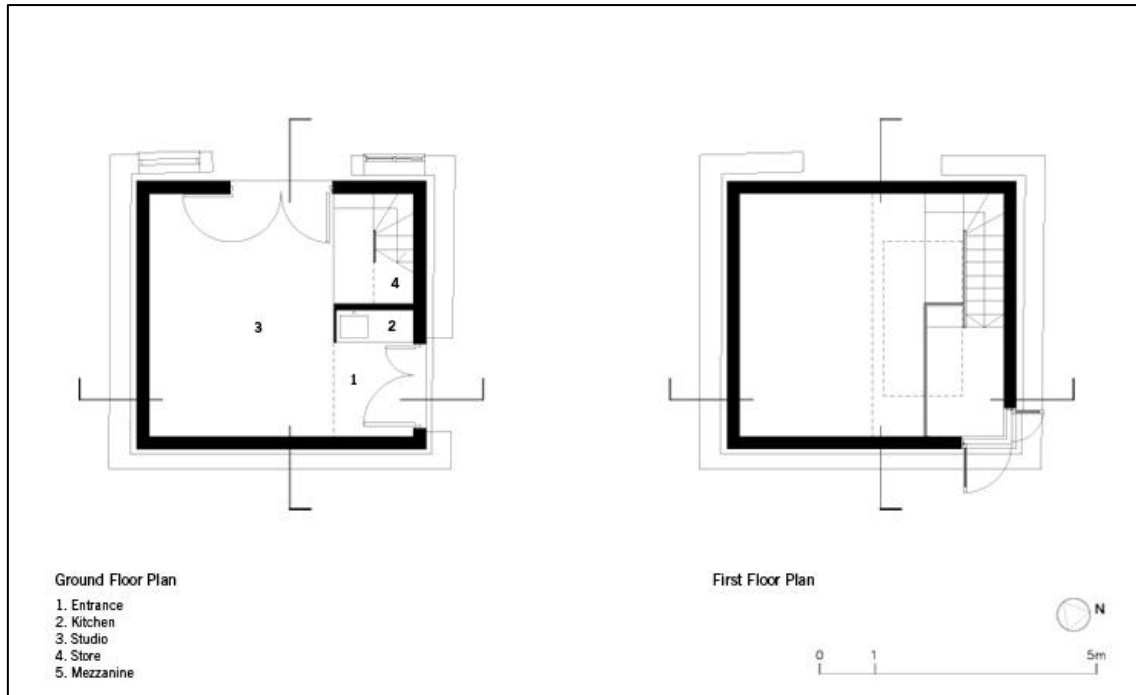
Floor plan drawings of the Dovecote Studio by Haworth Tompkins (2009)
